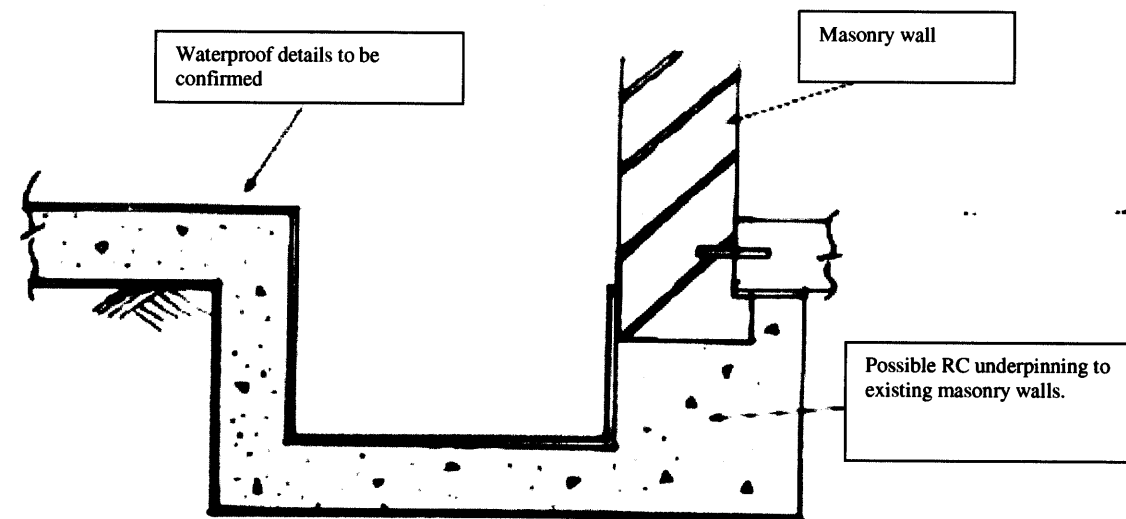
Indicative section through lift pit underpinning of existing masonry wall
